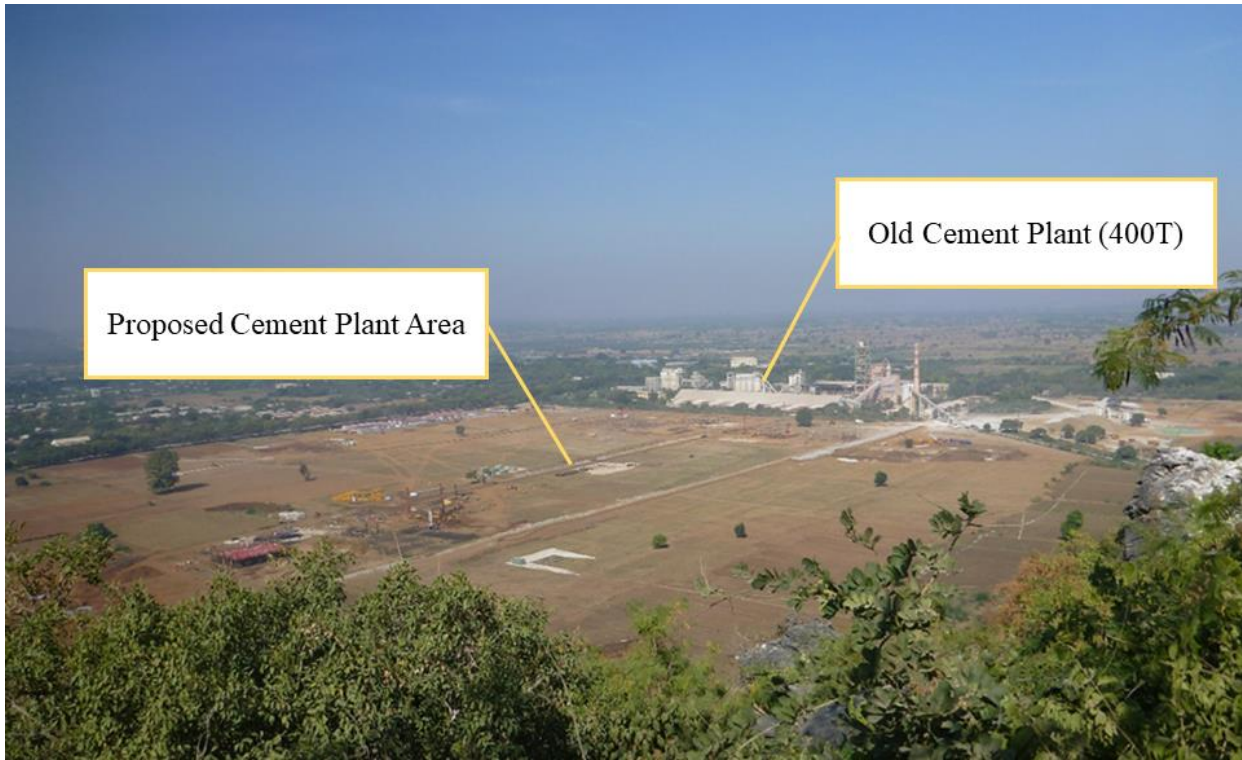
Proposed cement plant area and old cement factory (2014)
